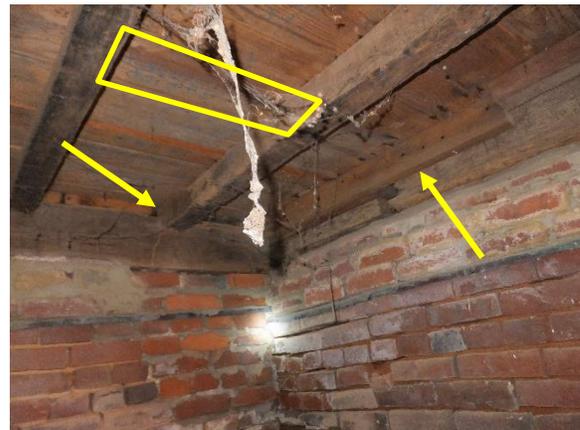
Rough hewn floor beams notched to timber sills and brick foundation. Note areas of retrofits with machine cut members, rebuilt brick, and copper flashing. Also note writing at the underside of the flooring.
